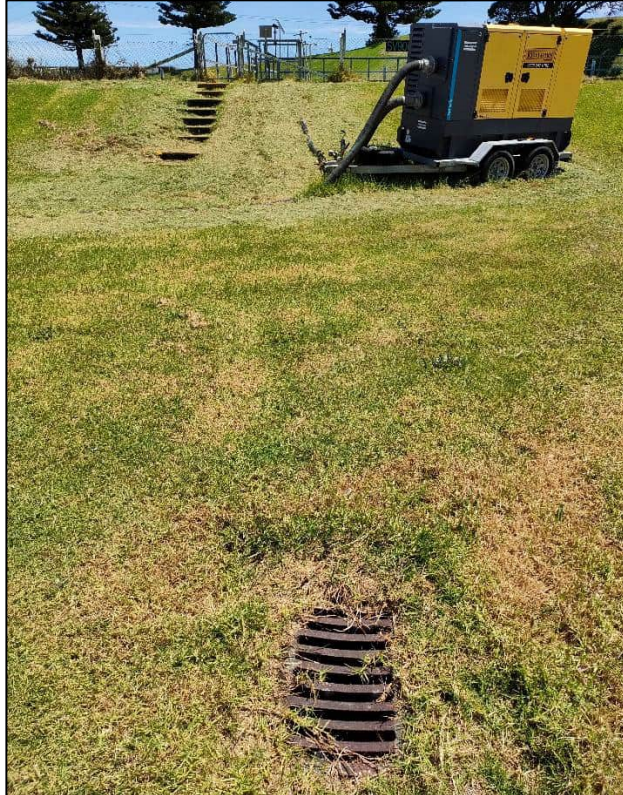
Welded fill point for town mains water adjacent to Building 30.
